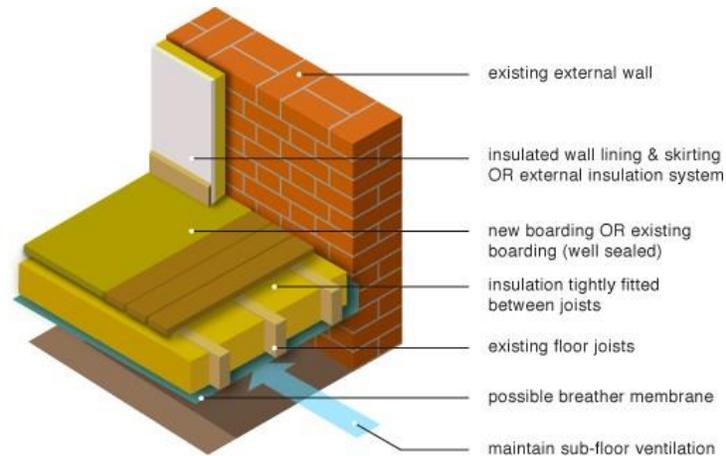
Timber ground floor insulation (Source: www.greenspec.co.uk buildingdesign).
